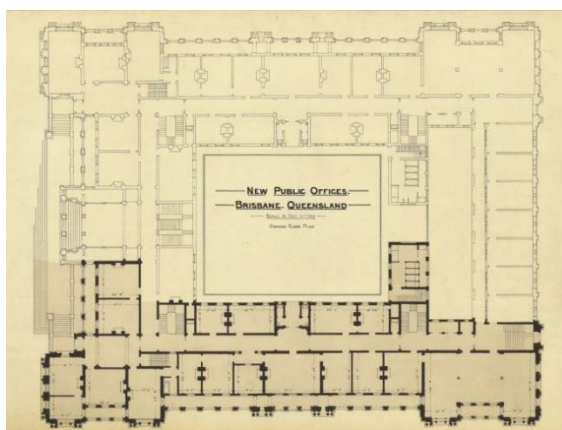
Treasury Building, Ground Floor Plan, 1888
